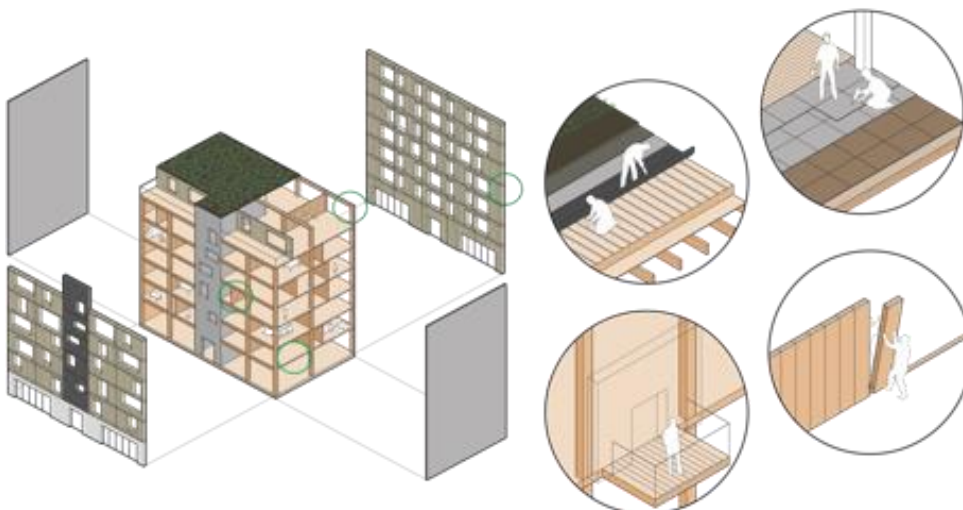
Design concept for a reversible timber skeleton building made from CDW
